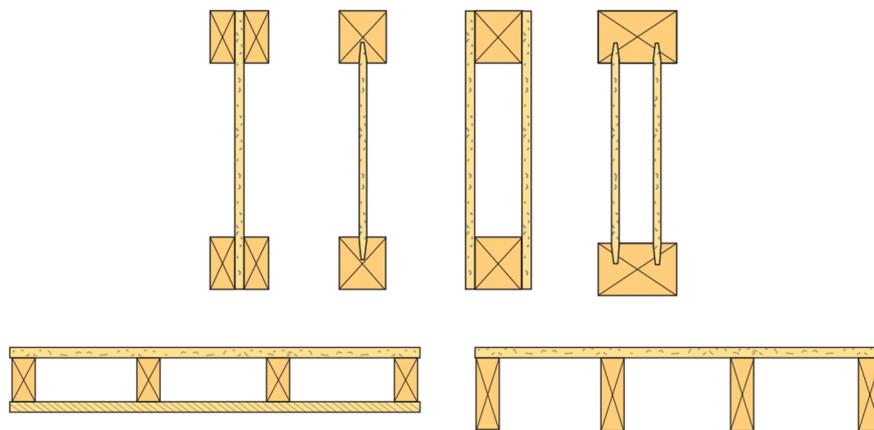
Typical cross-sections of thin webbed beams and stressed skin panels: I-sections and box-sections (top), H and T sections (bottom) (Norlin, 2016)
